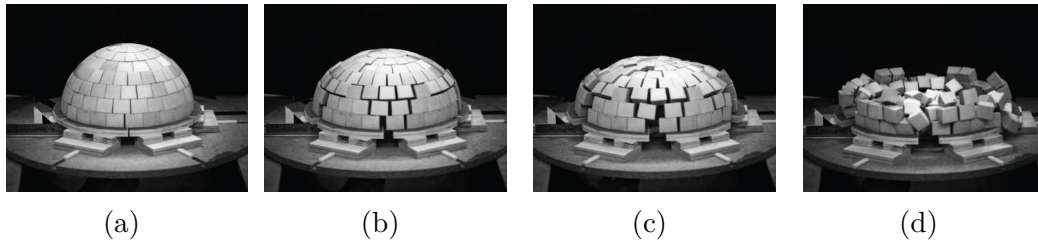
Structural failure mode of a masonry dome on spreading supports (a-d). Credit: [Quinonez et al. \(2010\)](#).
